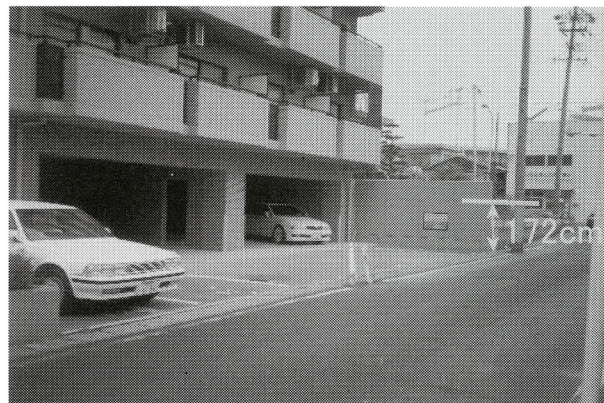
Flood mark on the wall of an apartment building located south of the JR Biwajima Station (Asahi-machi, Nishibiwajima Town).
